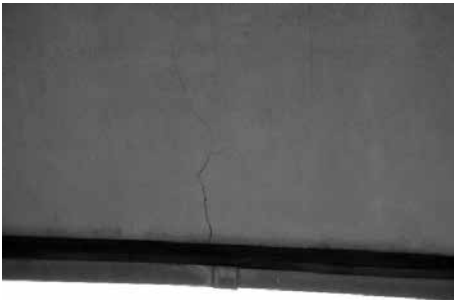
Illustration of techniques of repairing cracks - Sheet A4.
